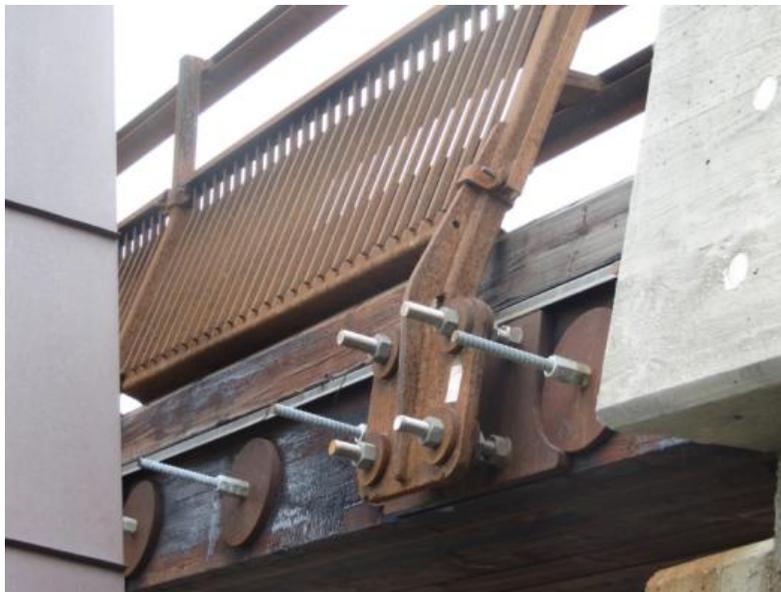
Metal plate connectors not too large to prevent drying on Sletta Bridge in Norway.
